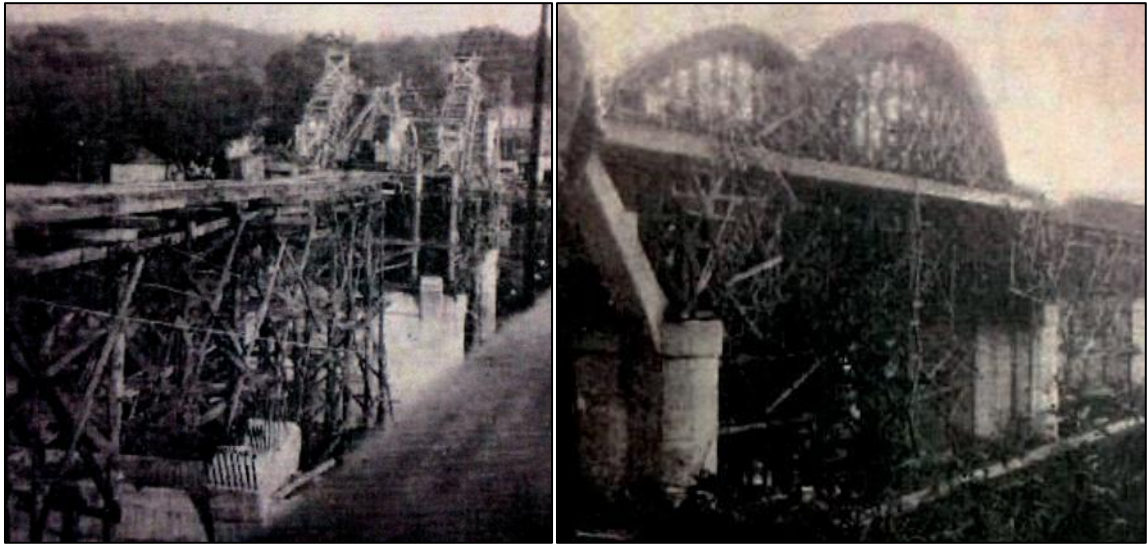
Construction photos of the Bibb Graves Bridge (Taylor 1930)
